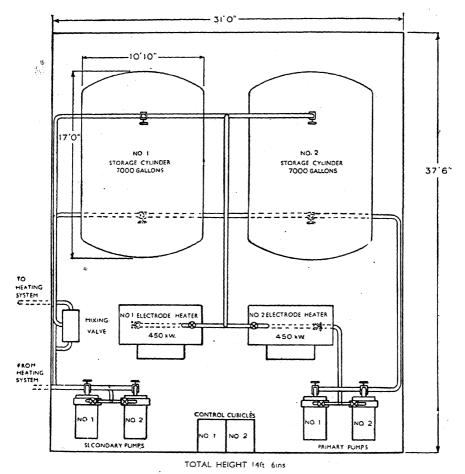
Typical boiler-house layout of electrode thermal storage plant for heating buildings
